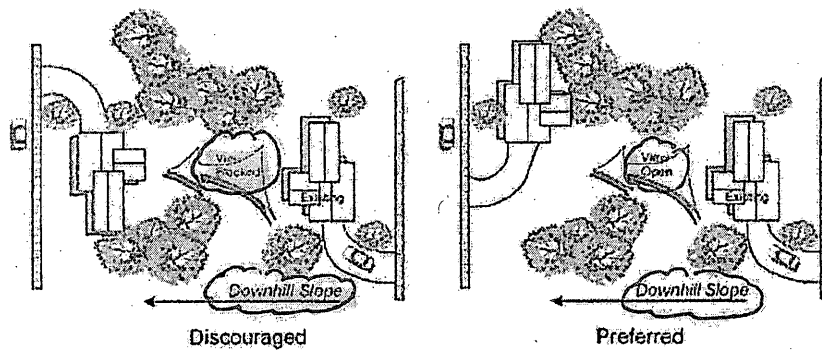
Example of Preferred Location of Second Floor to Preserve Views
